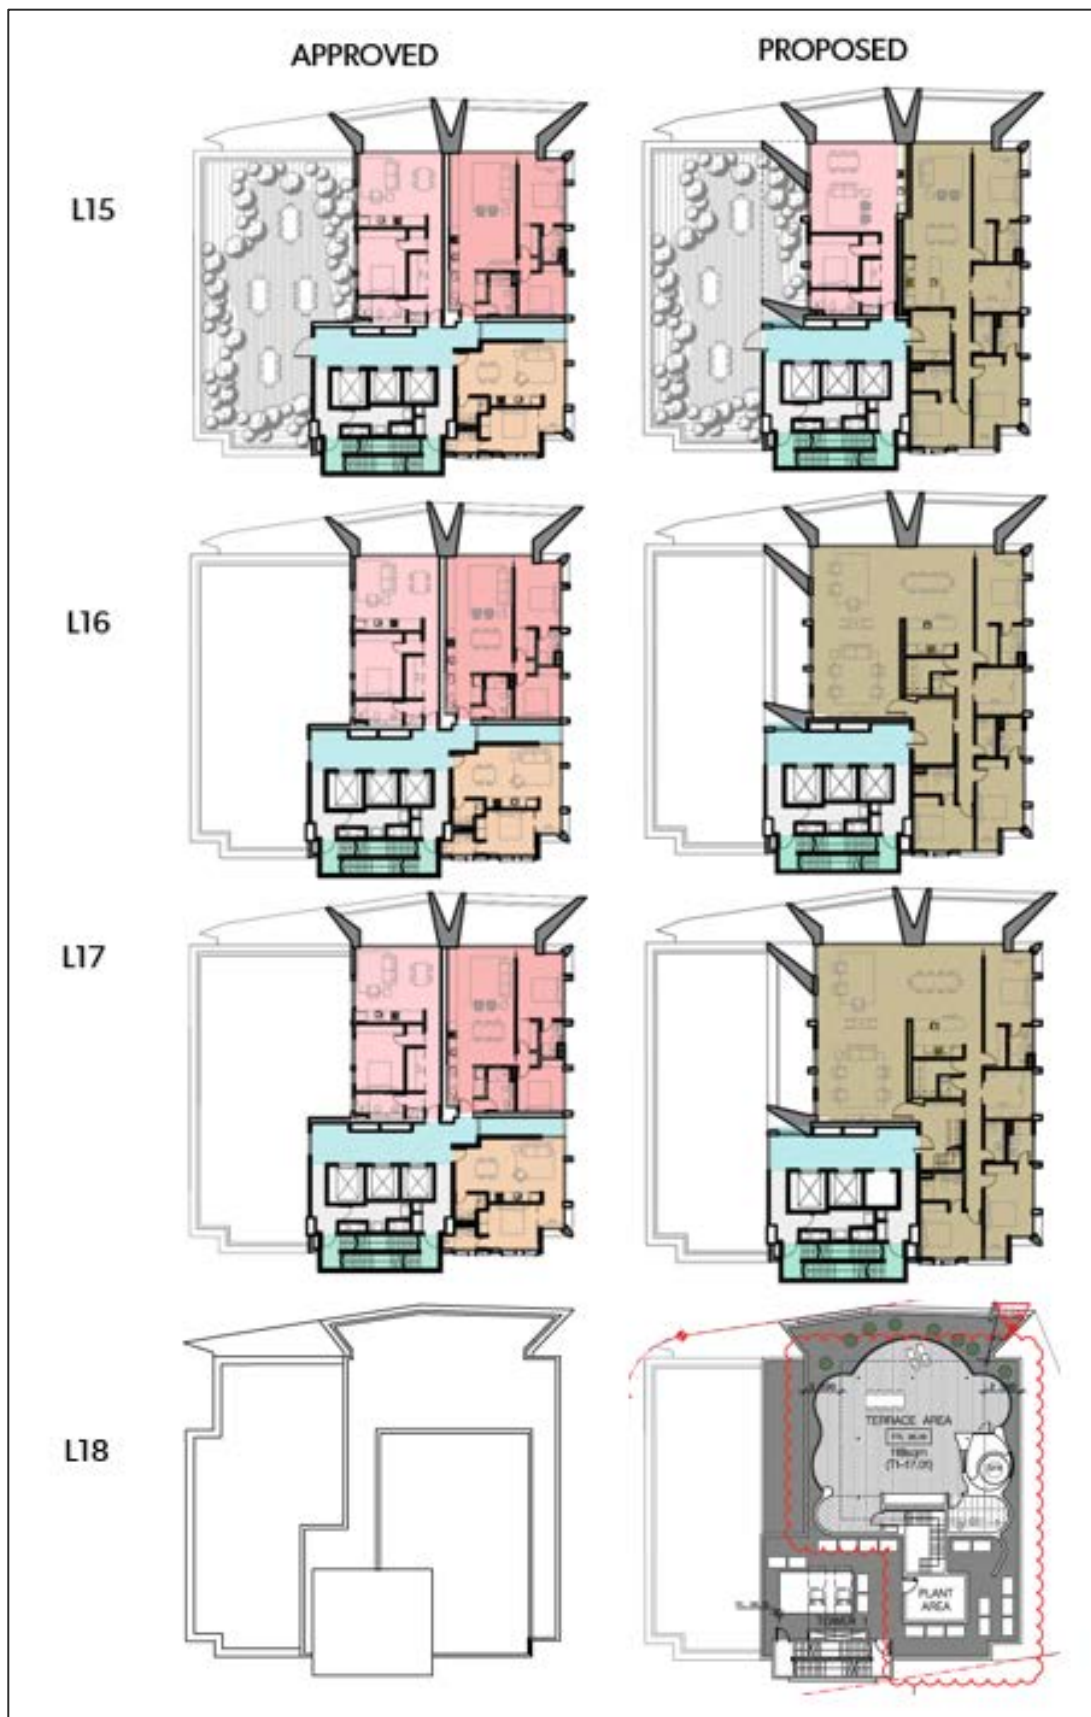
| Reconfigured units, new balconies and roof terrace (Base source: Approved Plans MOD4 and Architectural Plans).
